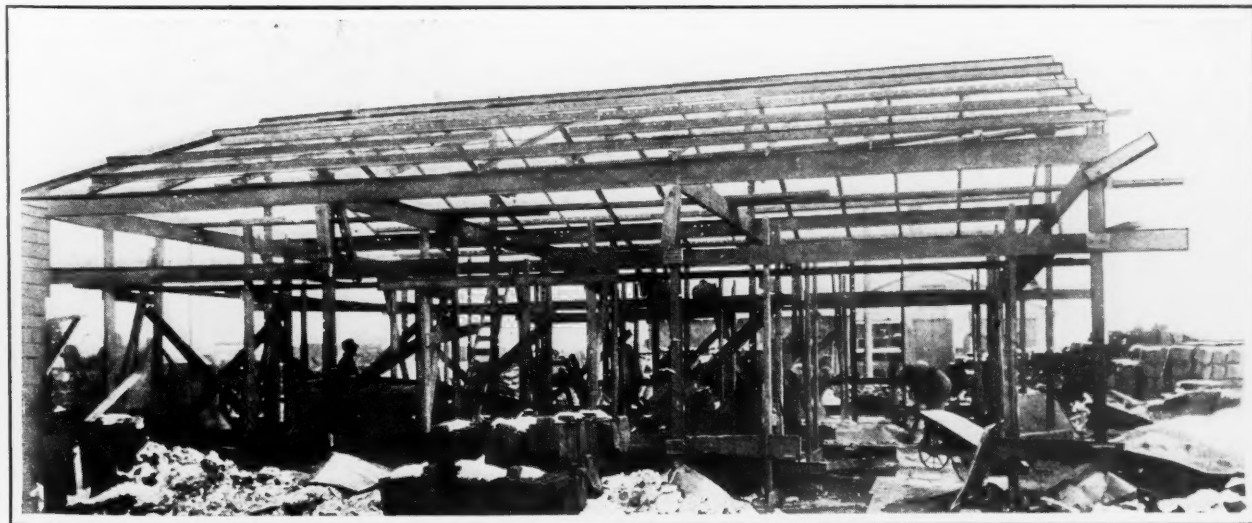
Arc-welded Building Frame, 40 Feet Wide and 60 Feet Long
